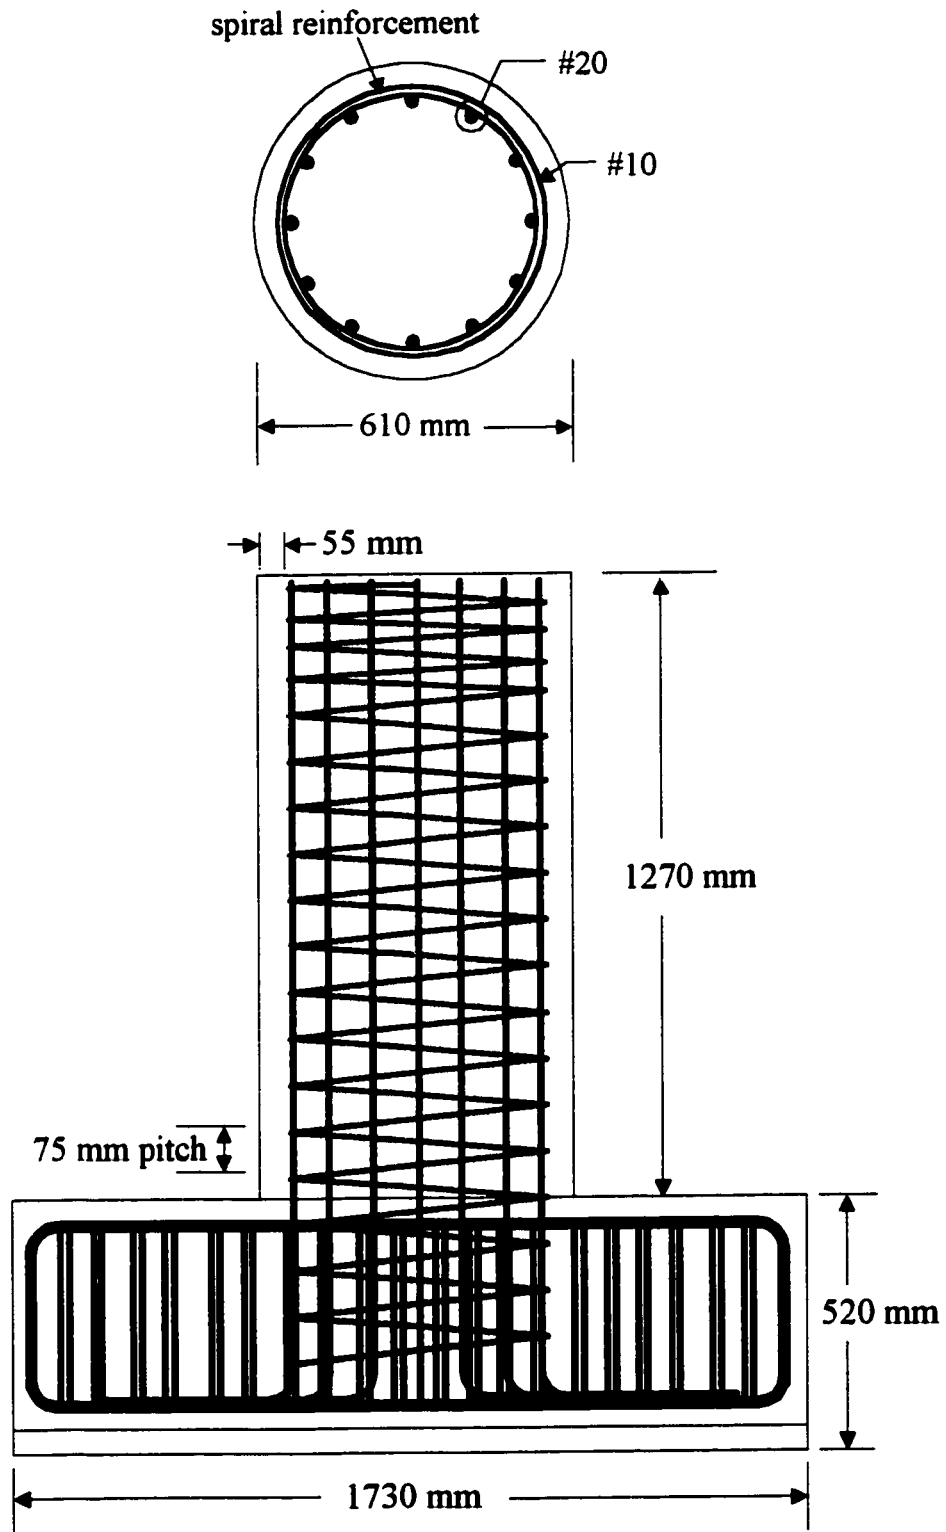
Dimensions and reinforcement details for columns BR-SP1 and BR-SP2
